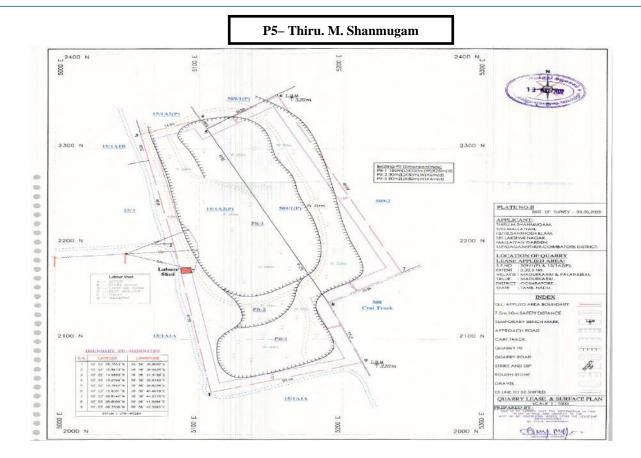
QUARRY LEASE PLAN & SURFACE PLAN
